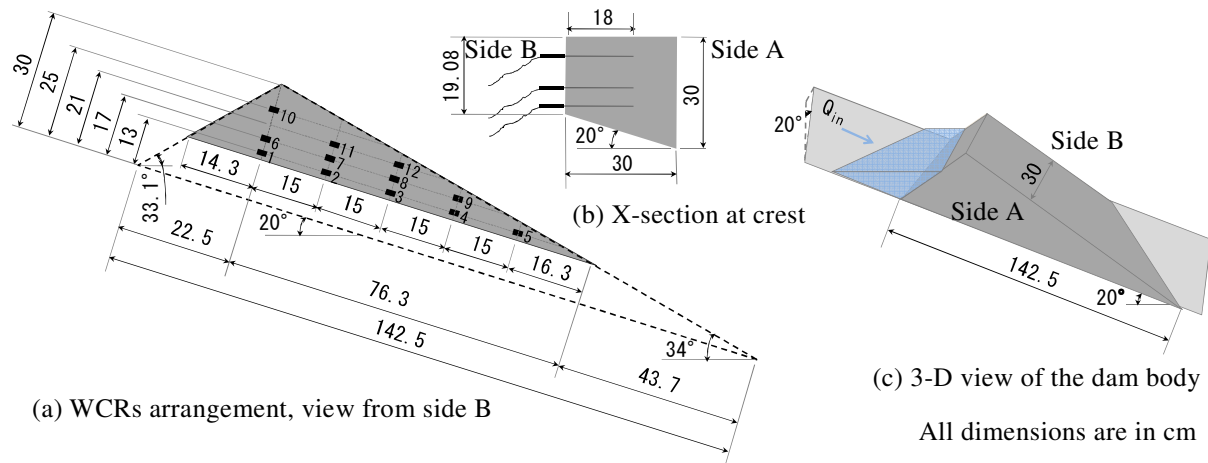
Three dimensional dam body shape and size with the arrangements of WCRs (1-12)
